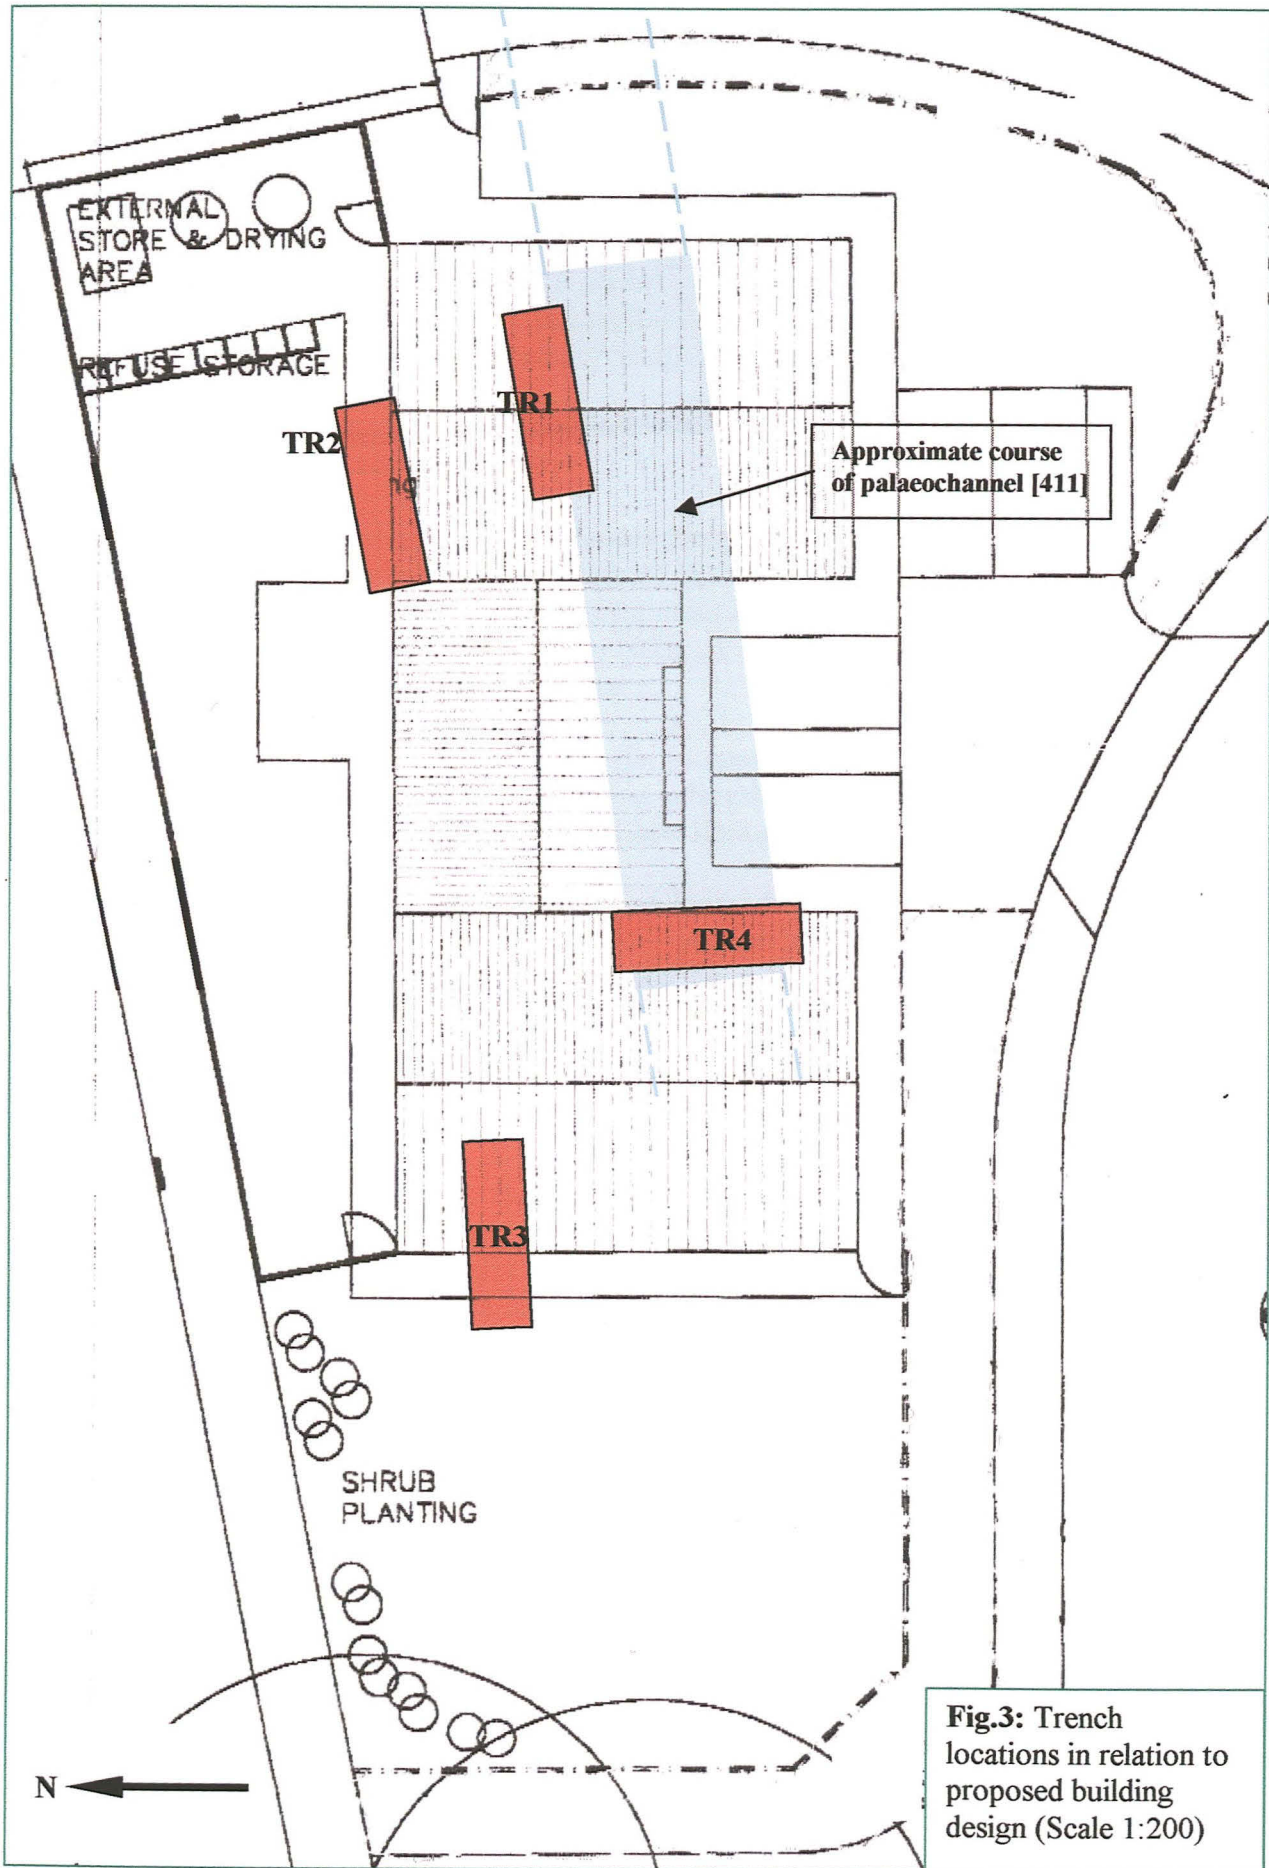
Trench locations in relation to proposed building design (Scale 1:200)
